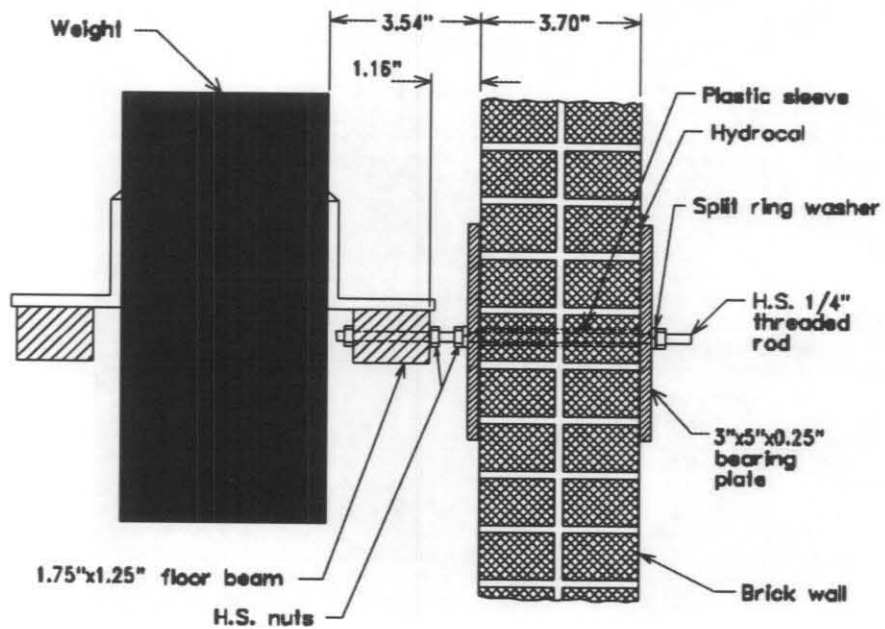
Beam/Out-of-plane Wall Connection Detail
